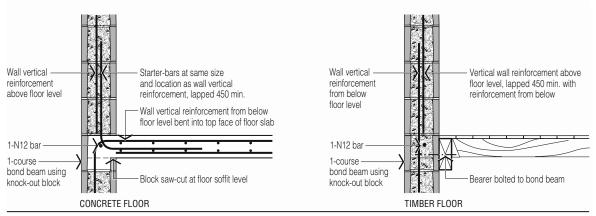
Typical Details for Bond Beams Supporting a Floor
